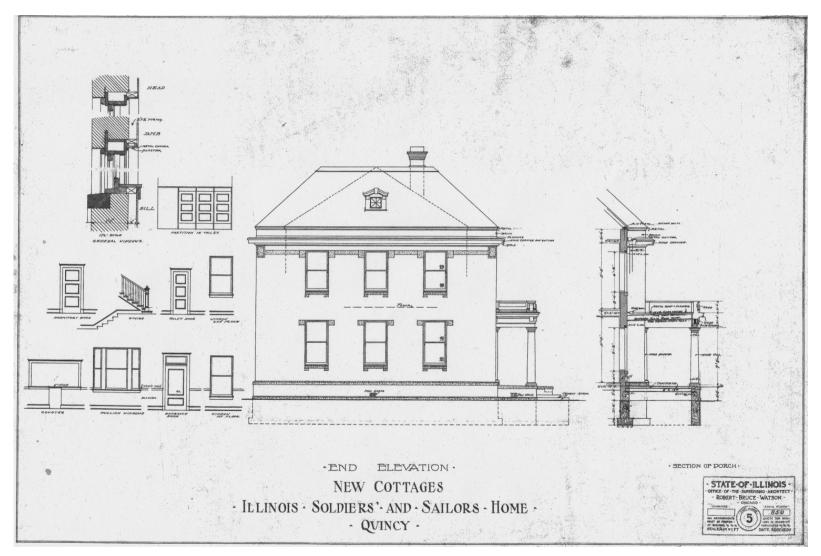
Elevation view of the north end of Building 11/ Rowland Barracks, as originally designed (1905). A sectional through the front porch and typical window opening also are shown, as are various interior details.
